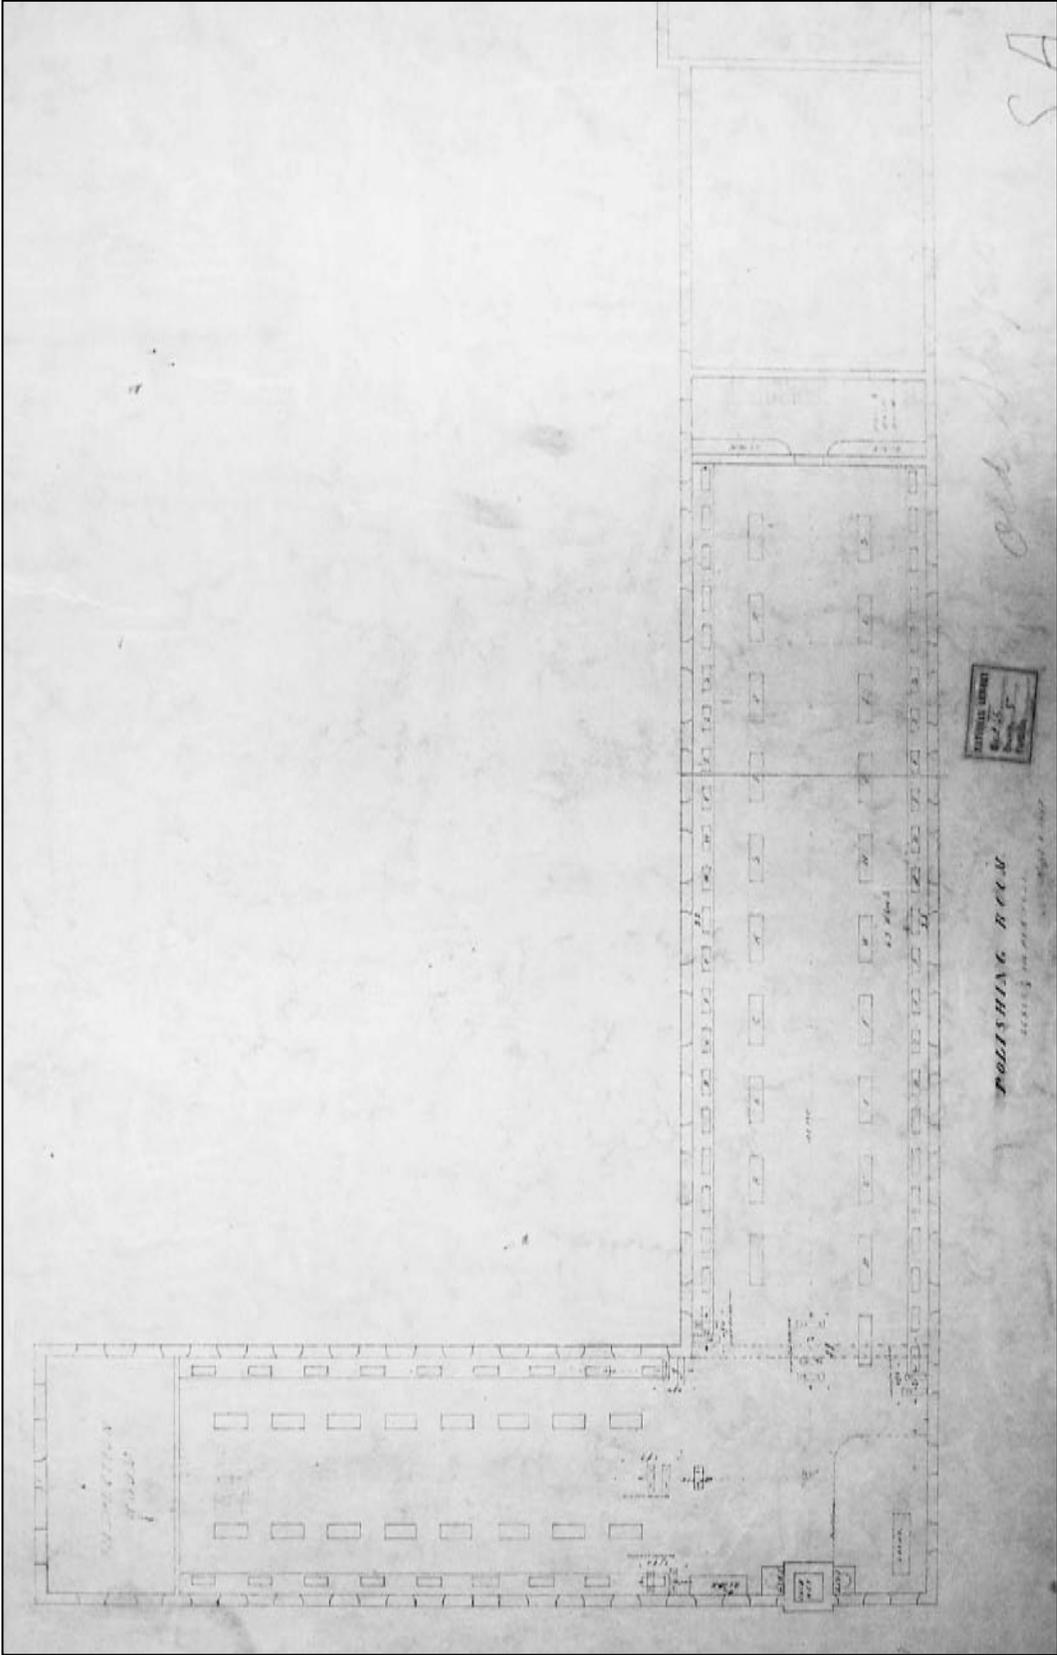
"Polishing Room, Sept. 6, 1862." The drawing depicts the first floor plan of the west end of the main block and west wing of Building 27, all of which was later removed; not to scale.
